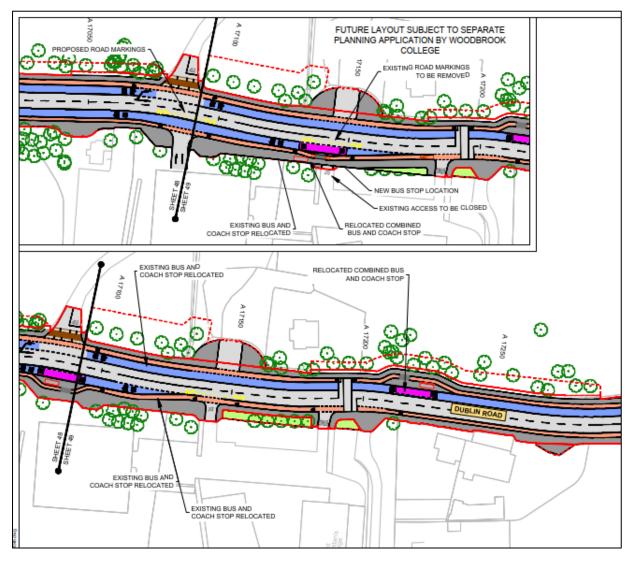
Extract from General Arrangement Drawing at Woodbrook College (Sheet 49)
